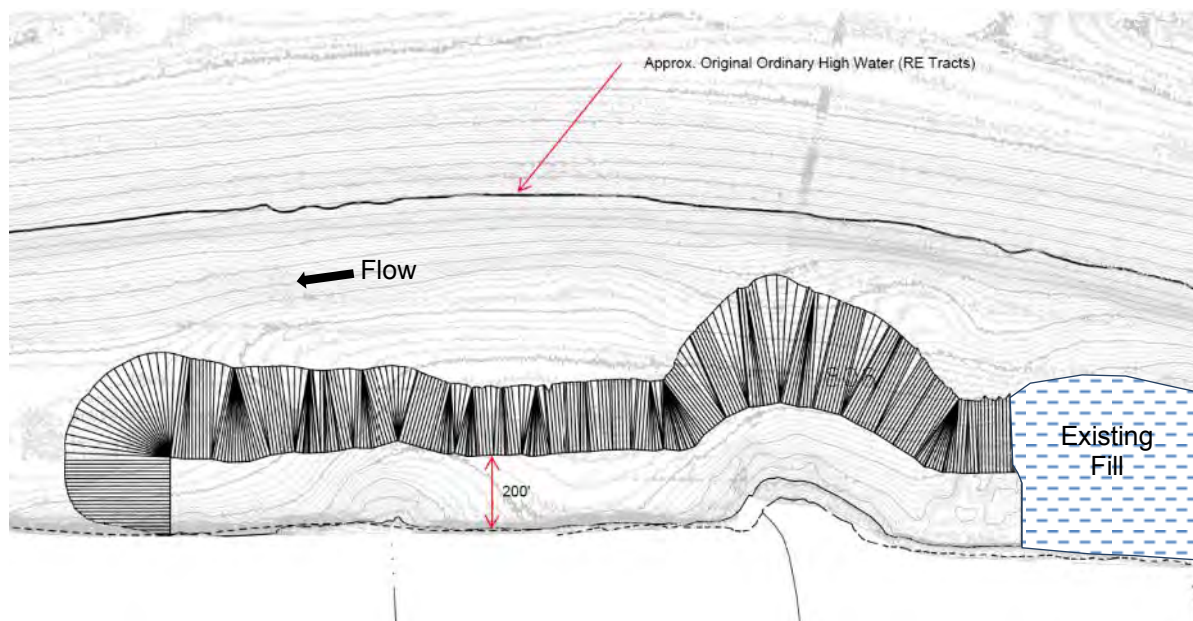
Dredge material placement showing the 200-foot wide shallow-water bench and the steeper side slopes (shaded).
